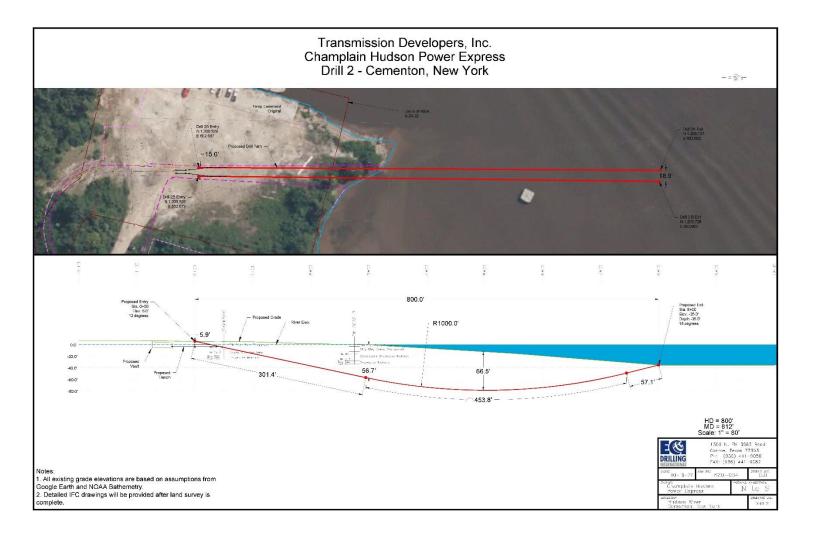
HDD Plan and Profile Drill - Cementon, NY
